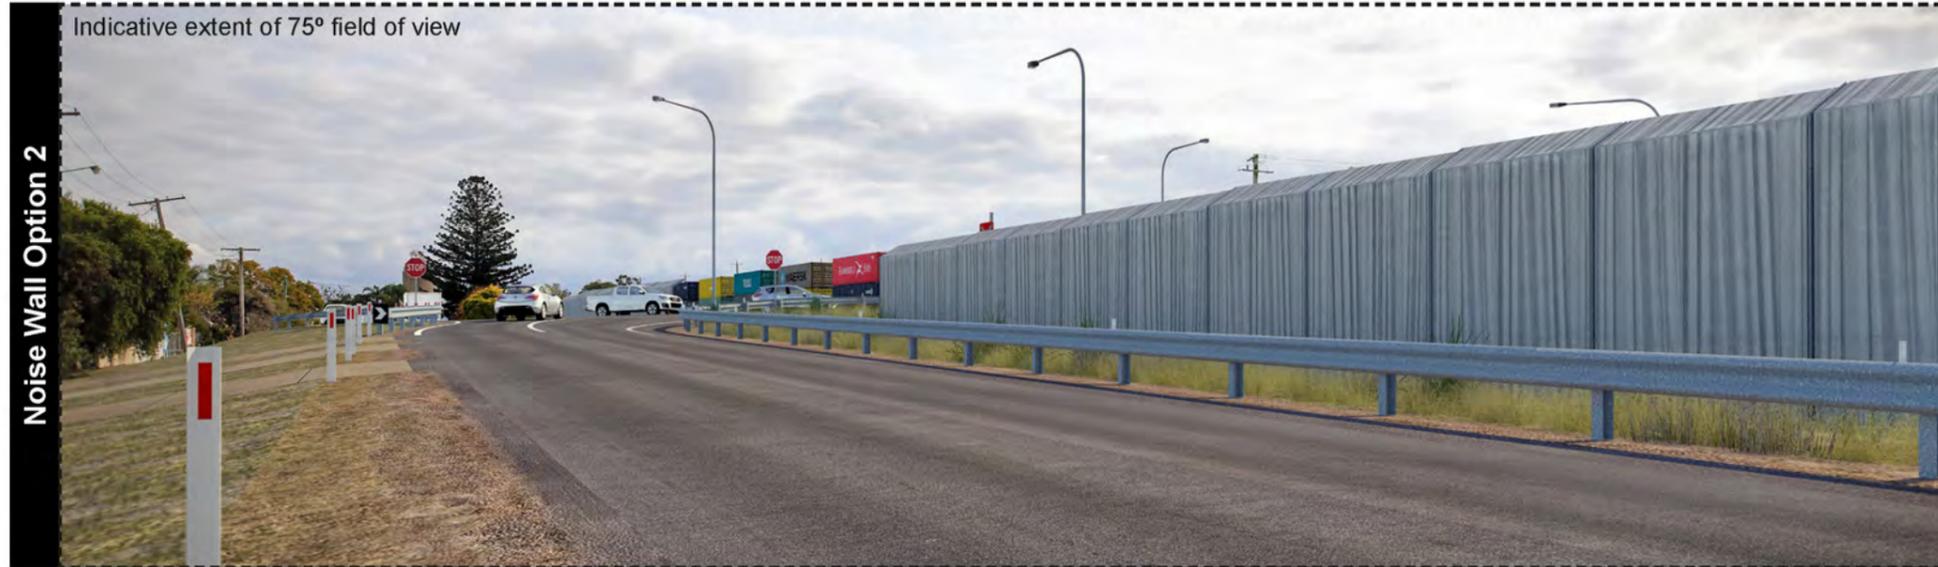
Viewpoint 8: Laidley-Plainlands Road looking north towards bridge crossing
